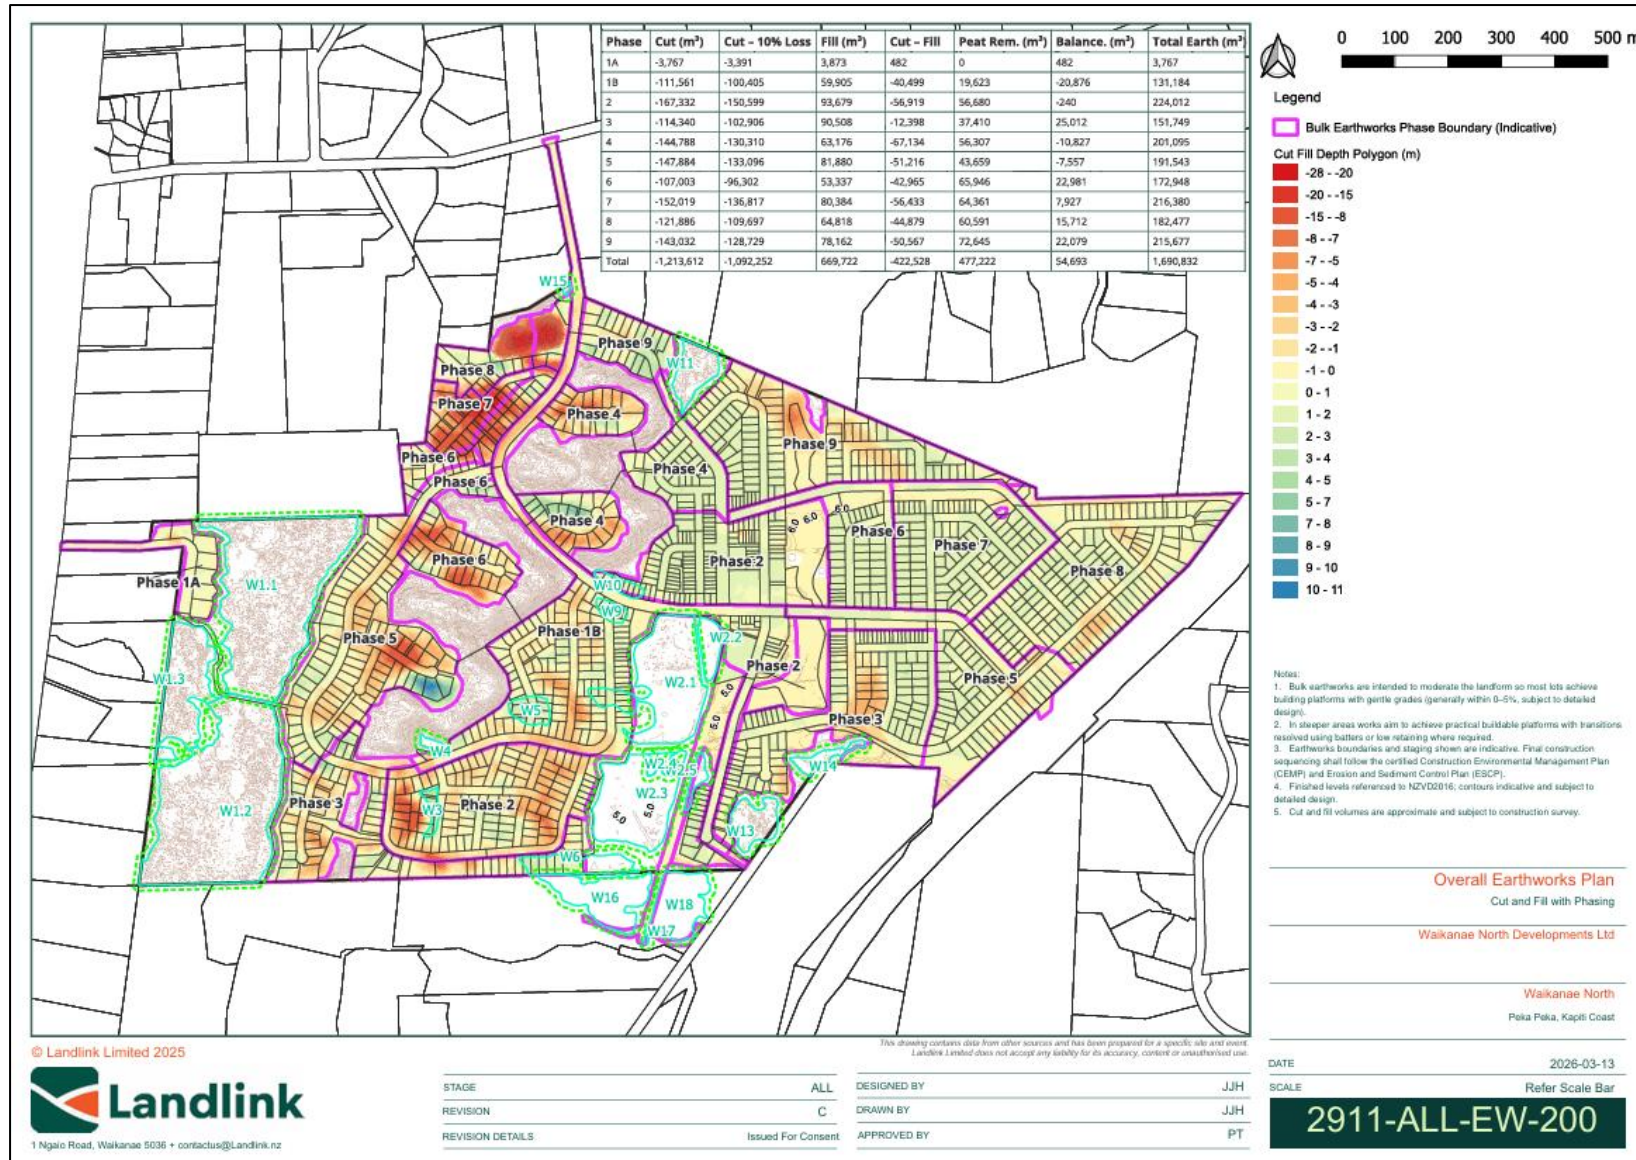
Cut and fill earthworks plan for Waikanae North Development.
